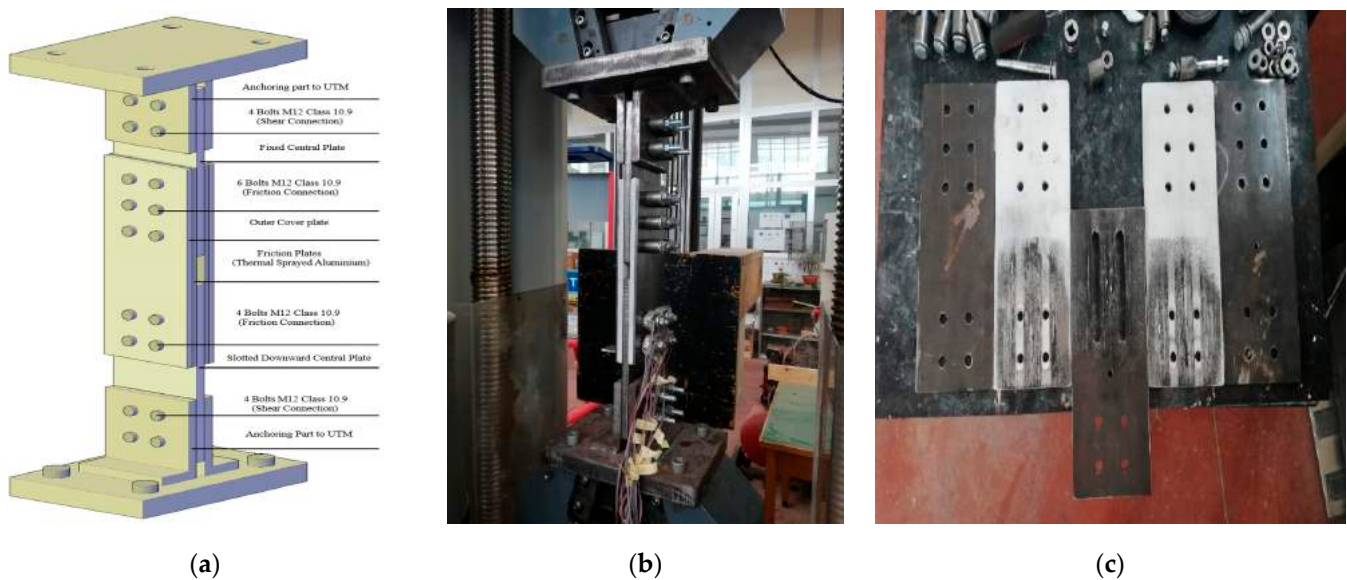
(a) Geometrical details of the uniaxial friction device; (b) tested specimen; (c) thermal sprayed aluminum and cover plates after test (taken from [69]).
